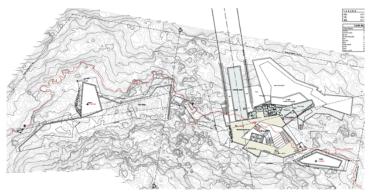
Extract: 1782_DA203 LEVEL 1 PLAN
